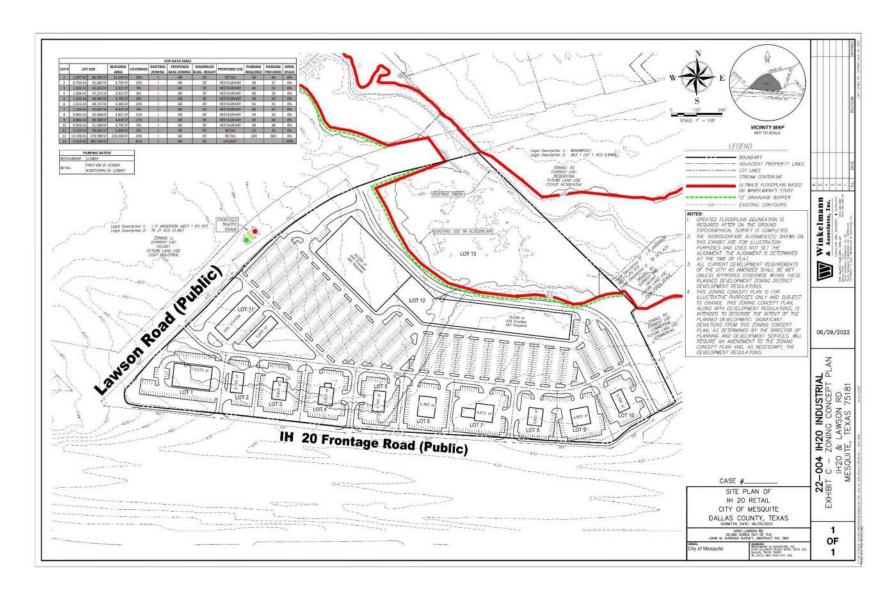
EXHIBIT E – FILE NO. Z0224-0349 CONCEPT PLAN 3 (NEW)
